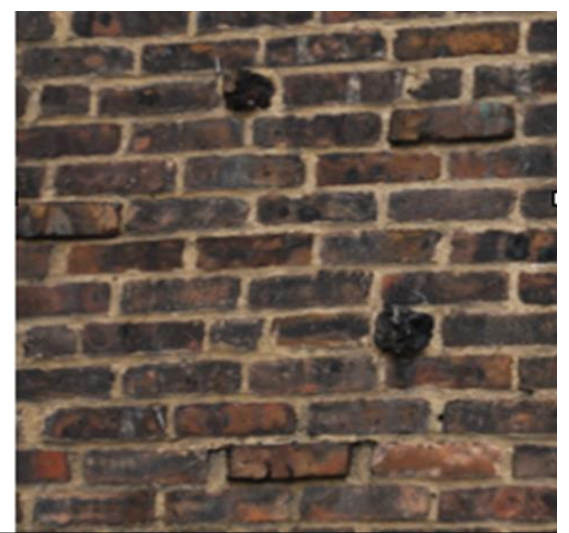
Image and Detail 5-5: Decorative Clinker Brick Ornamentation on Facade, 39-73 and 39-77 47th Street, Roosevelt Court, Queens, NY
